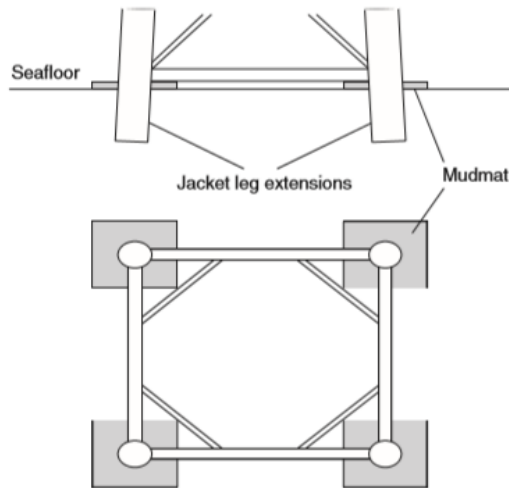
Square mudmats installed below the lowest bracing on a jacket [12]
